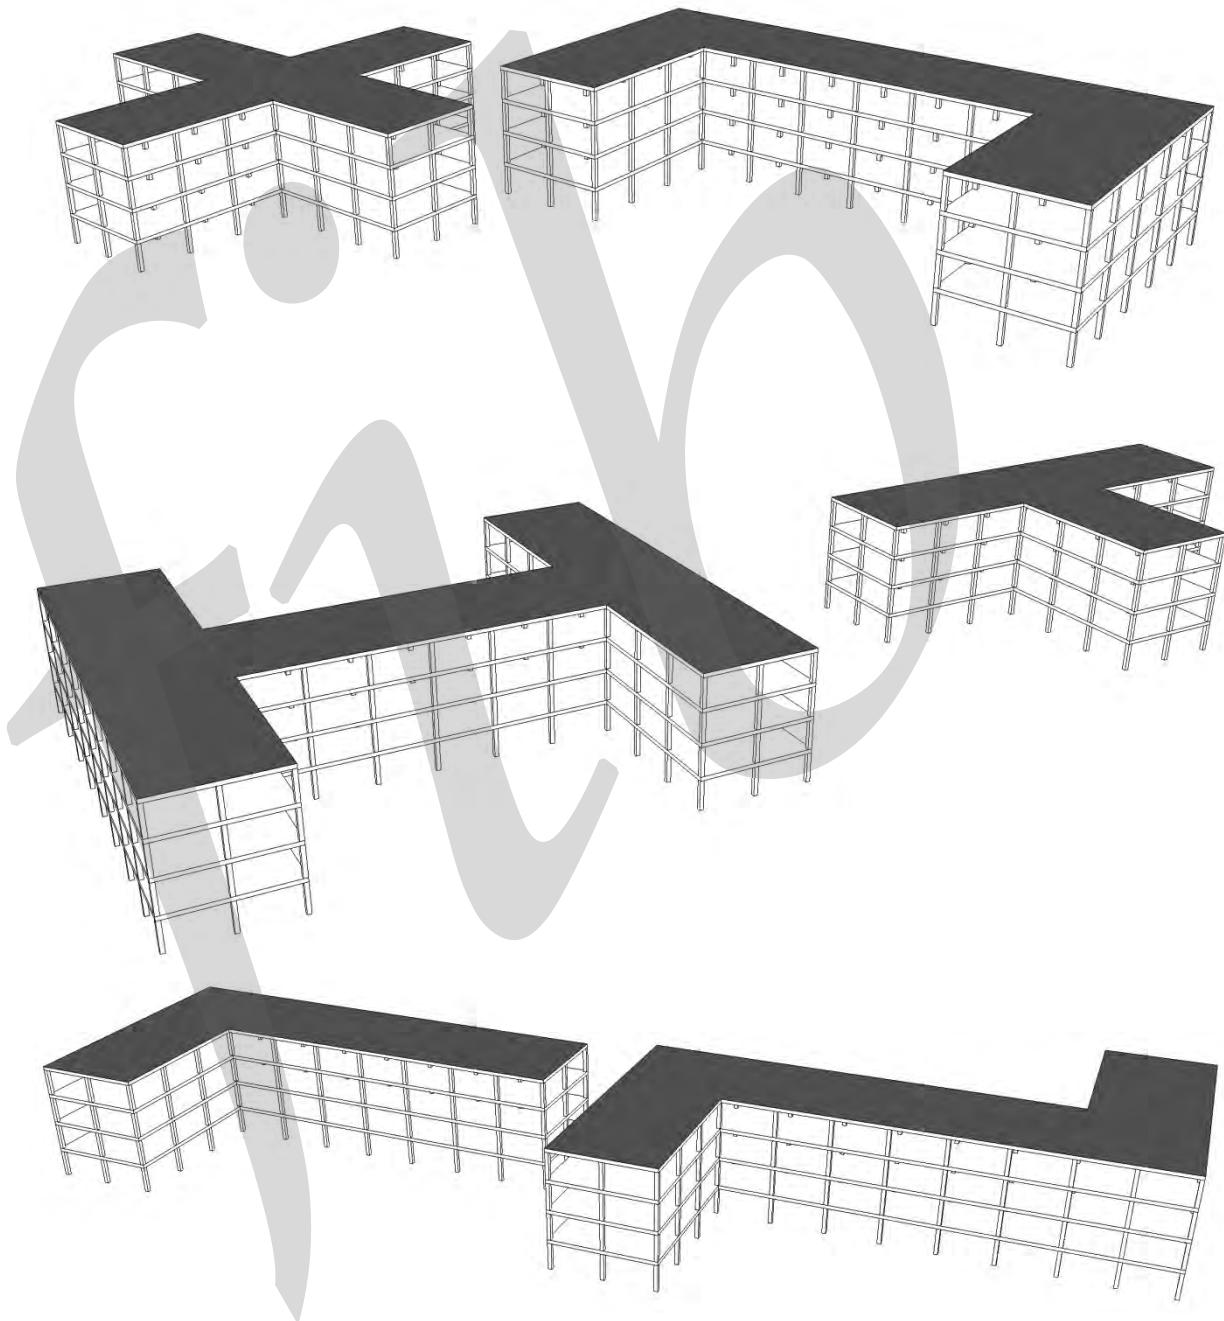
Building configuration in plan to be avoided or limited and given special attention [37]
